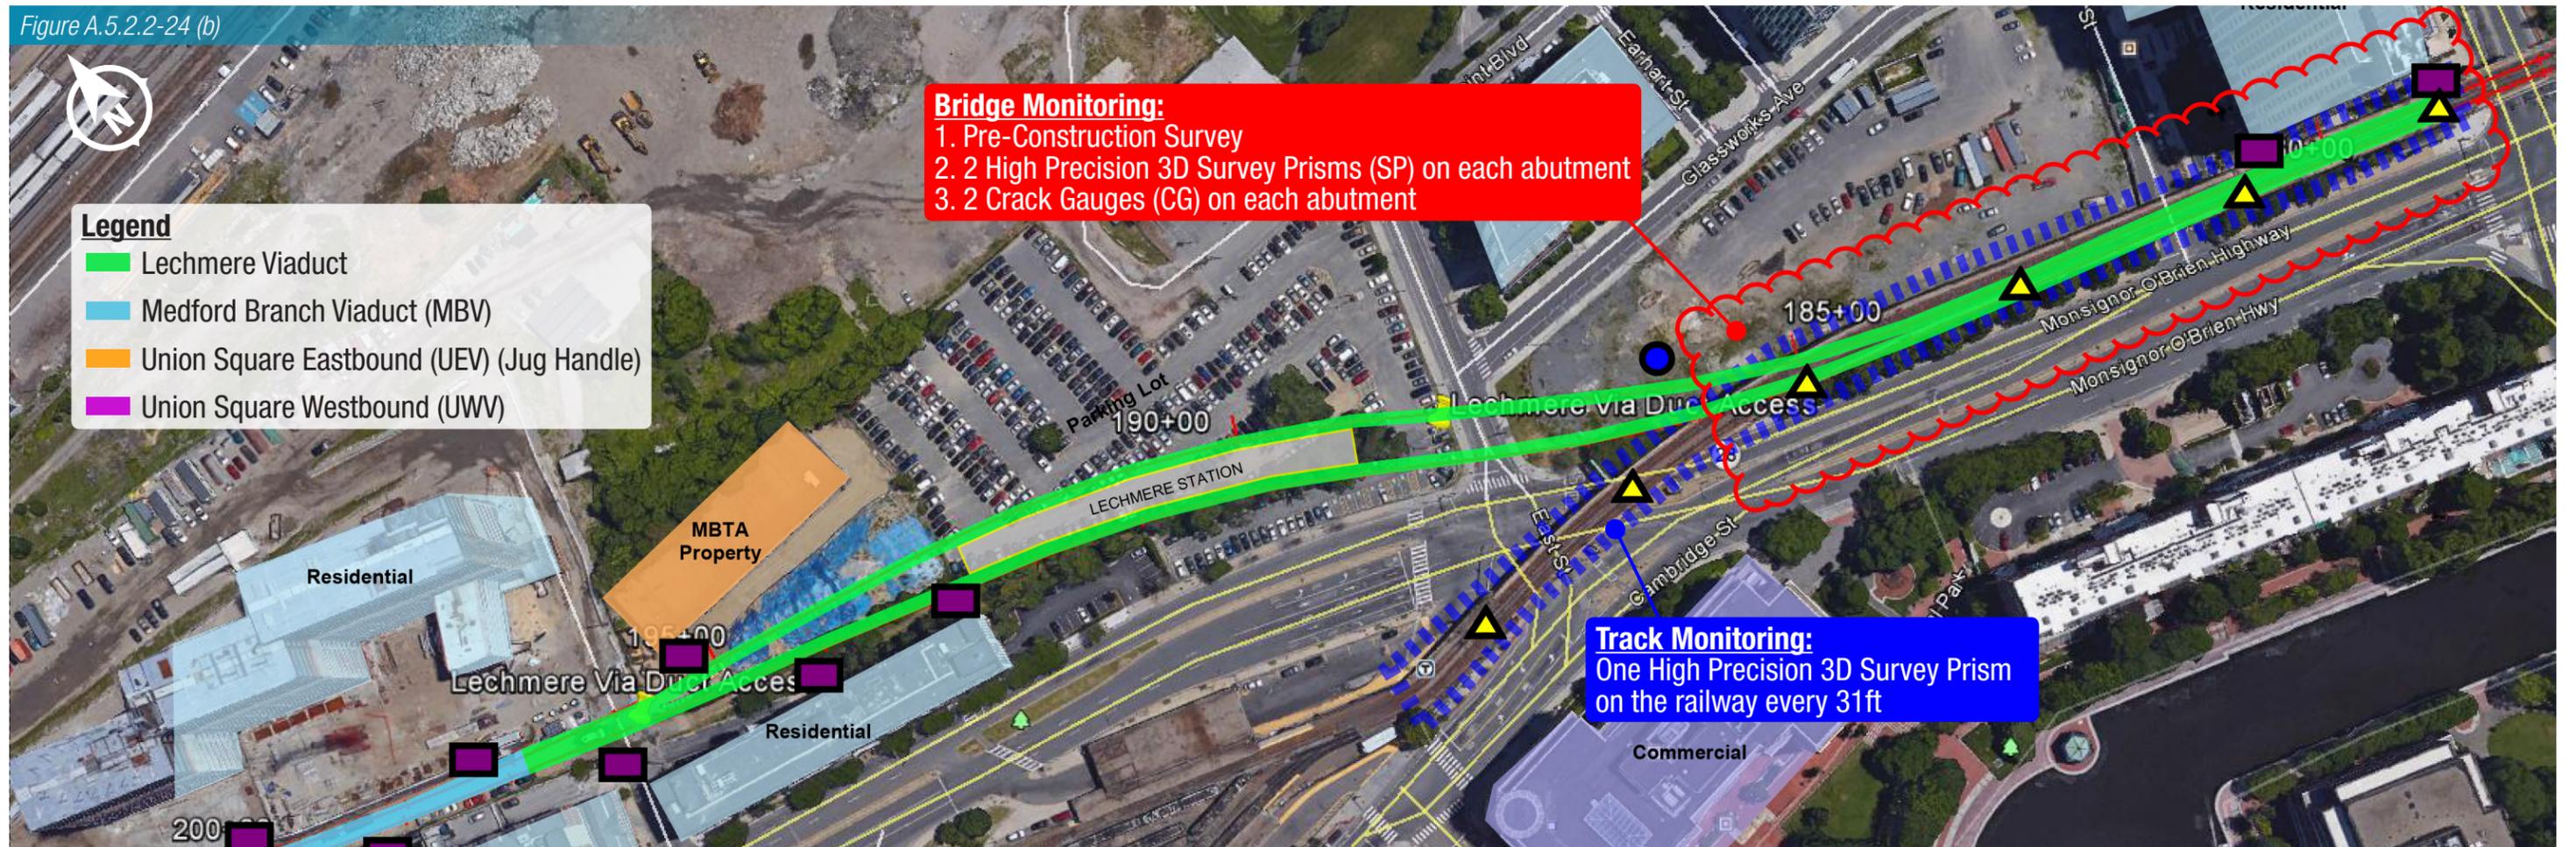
Based on proposed construction activities, GLP has developed instrumentation plans to monitor potential impacts (Typical).
